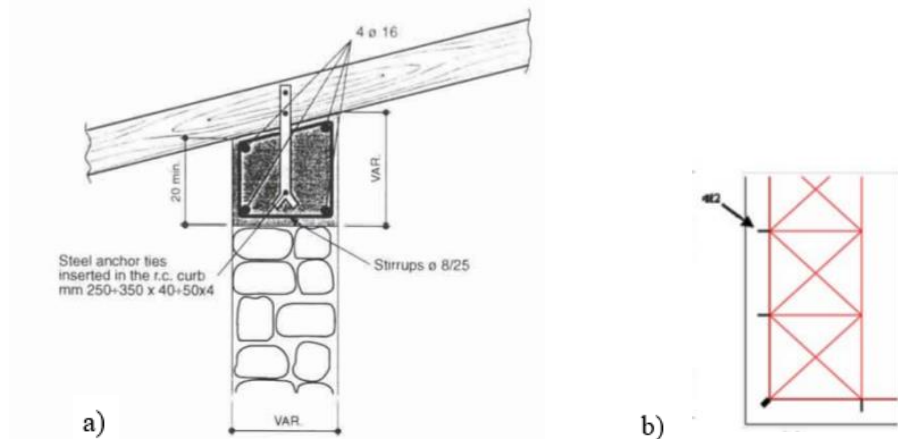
a) section view of a ring beam at the roof level. b) plant view of the ring beam
